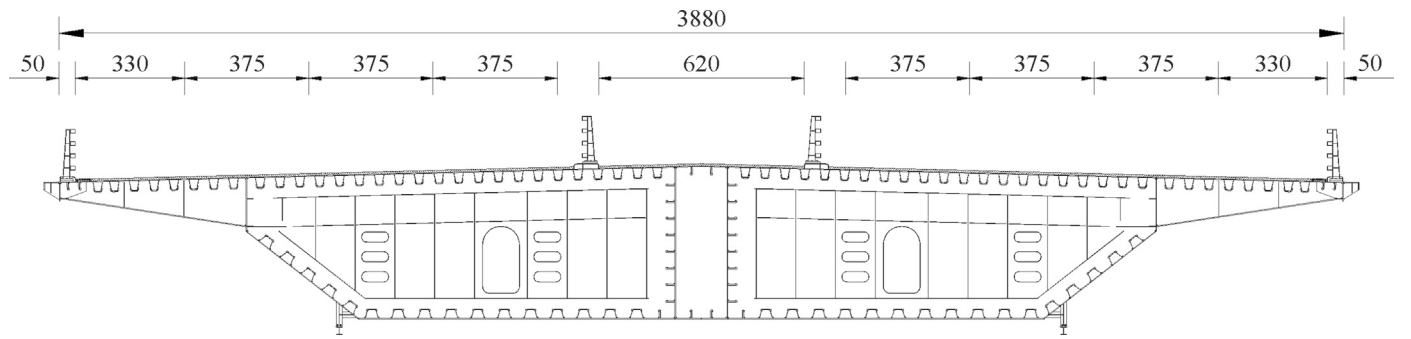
Box girder section of the Hongkong-Zhuhai-Macao Bridge (Unit: cm).
